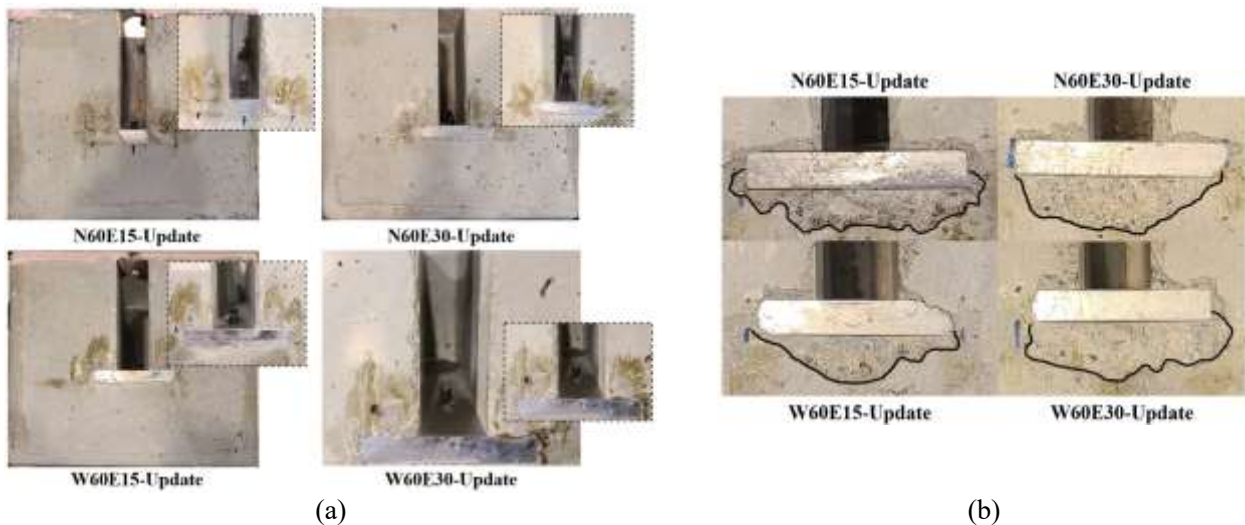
Bolt fracture and concrete crushing (a) bolt fracture, (b) concrete crushing.
